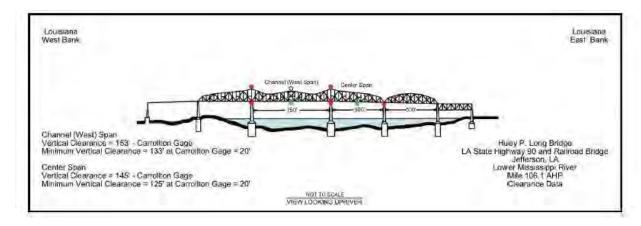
Huey P. Long Bridge, U.S. Hwy. 90 and Railroad Bridge
